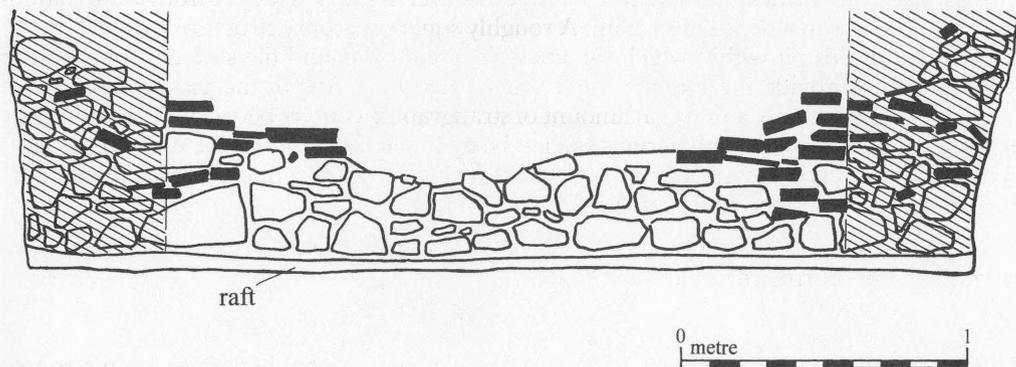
Borelli Yard, Farnham. The east or back wall of the kiln showing an elevation of the wall facing the oven and sections through the north and south walls (shaded).
